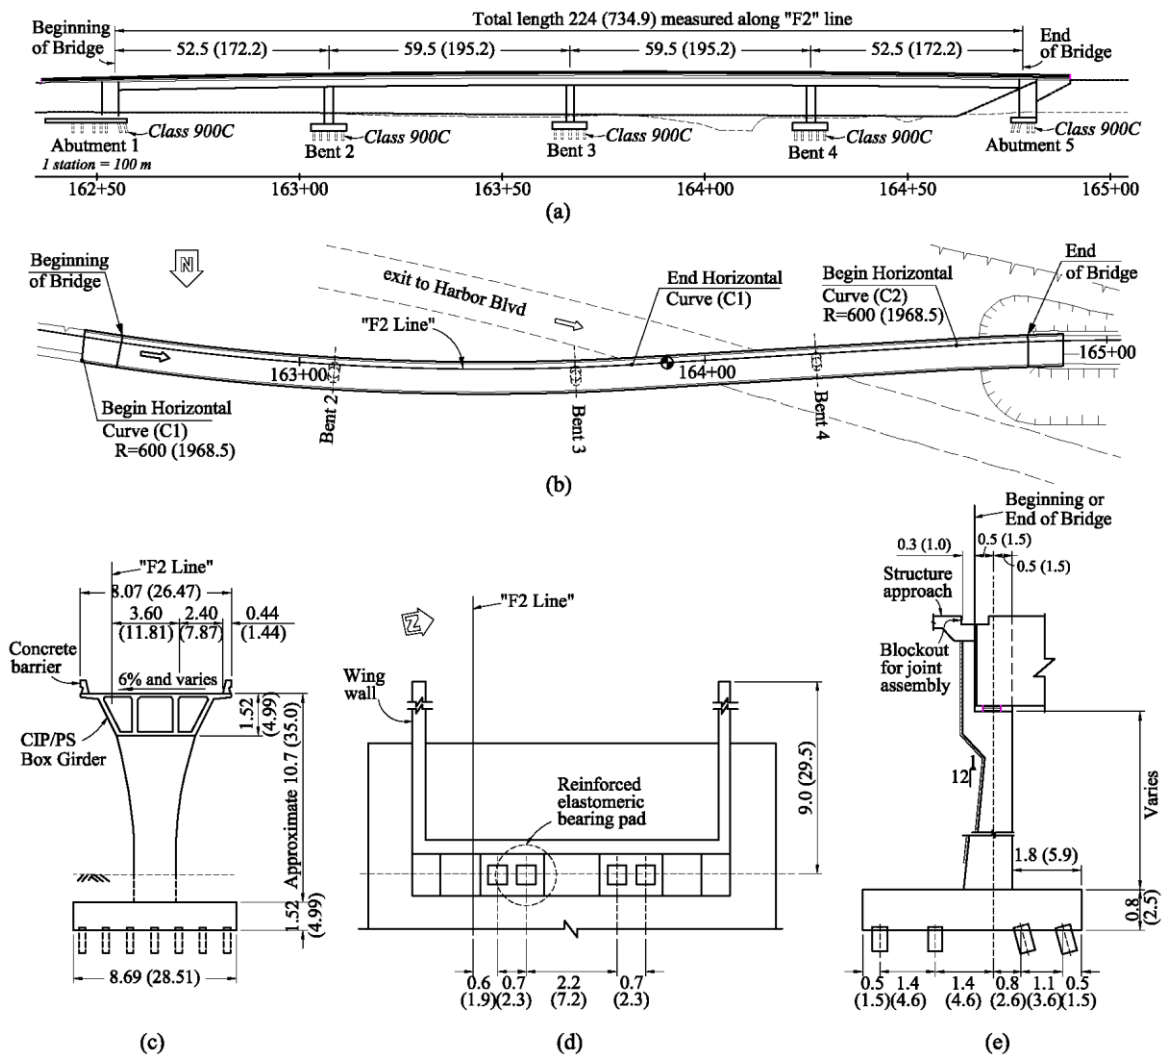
A close look of the Fairview Road On-Ramp Overcrossing (FRO) Bridge.
